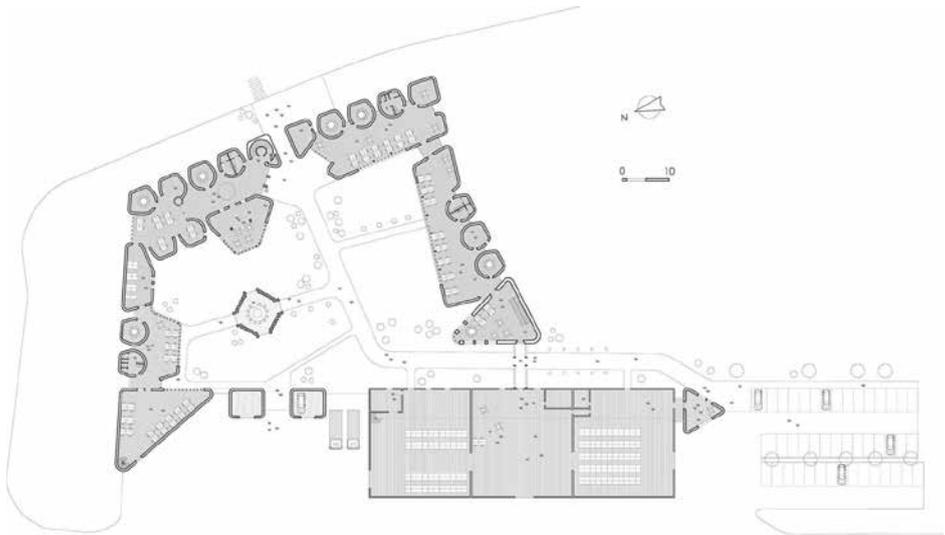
Plan view of the Citadelle Des Savoir-Faire ©Sylvain Pierre Jean Architects
